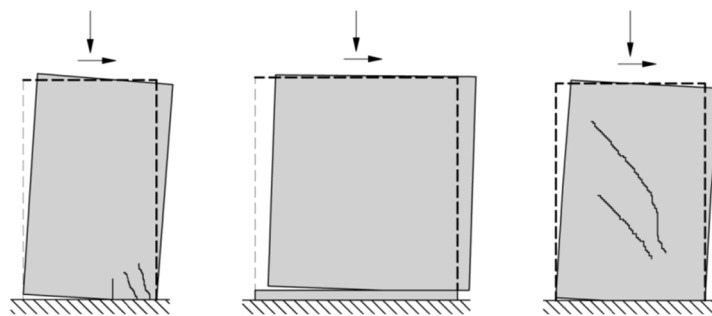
In-plane collapse of masonry walls: bending (a), sliding (b) and diagonal cracking (c).
